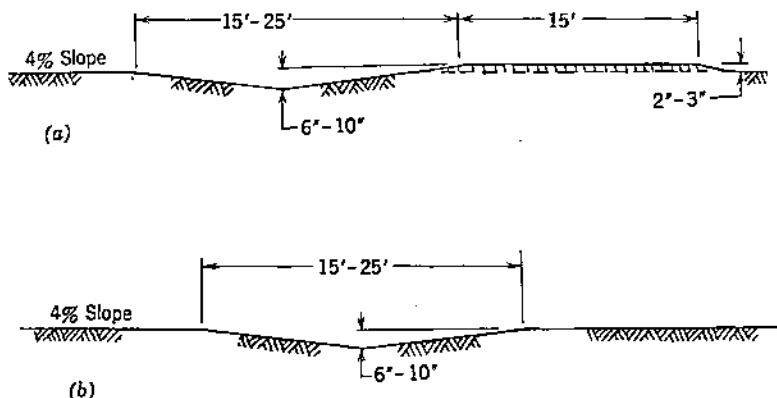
Cross sections of cross-slope ditches. (Redrawn from Wojta.¹⁰)
